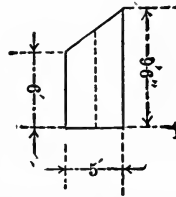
DEVELOPED PLAN OF ONE SIDE OF DORMER ROOF
